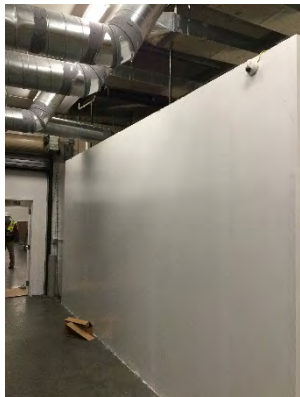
Central Clean Storage – Wall Added to Divide Central Clean Storage and Rx Stock Rooms; Security Cameras Installed
